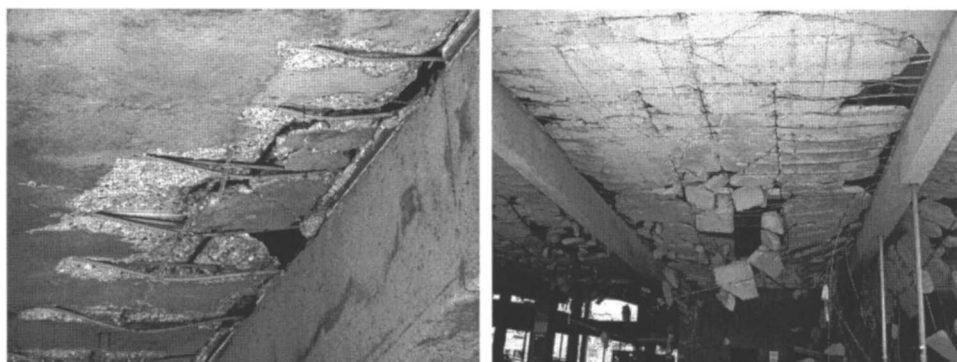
Uplift-induced shear failure of a posttensioned one-way slab
